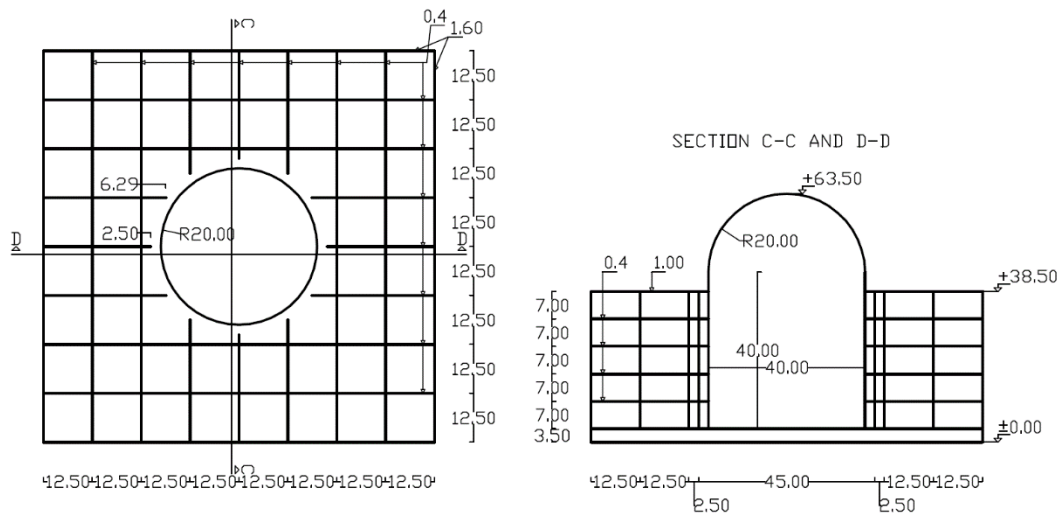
Floor plan (on the left) and section of the structure (on the right).
